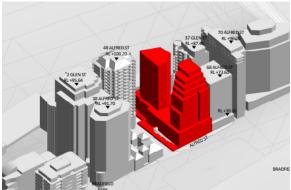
Amended building envelope responding to proposed DCP (from Alfred Street South)
